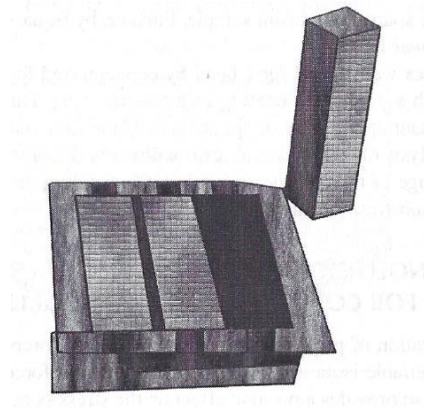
Concrete samples with a coating during natural hardening (concrete beams measuring 160x40x40 mm, reinforced by one bar D6 mm).
